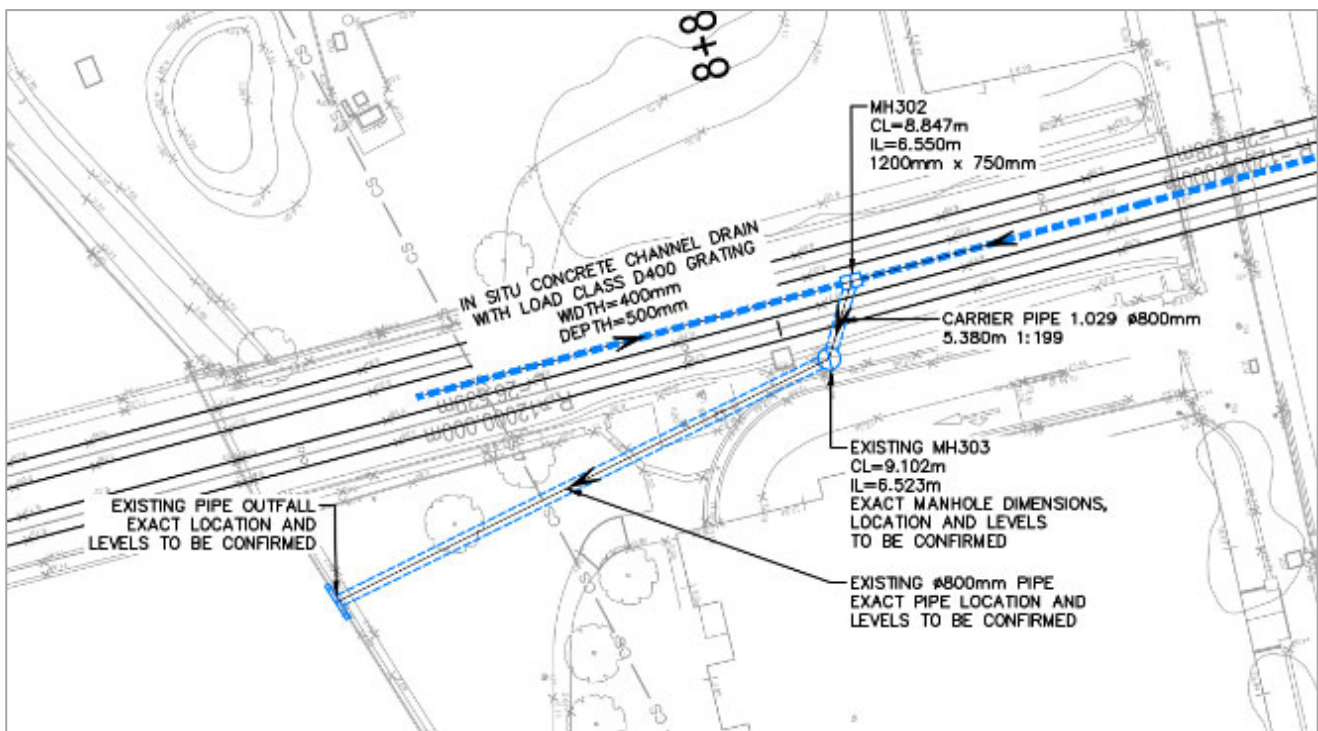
Proposed Drainage Works at Liffey River Outfall
